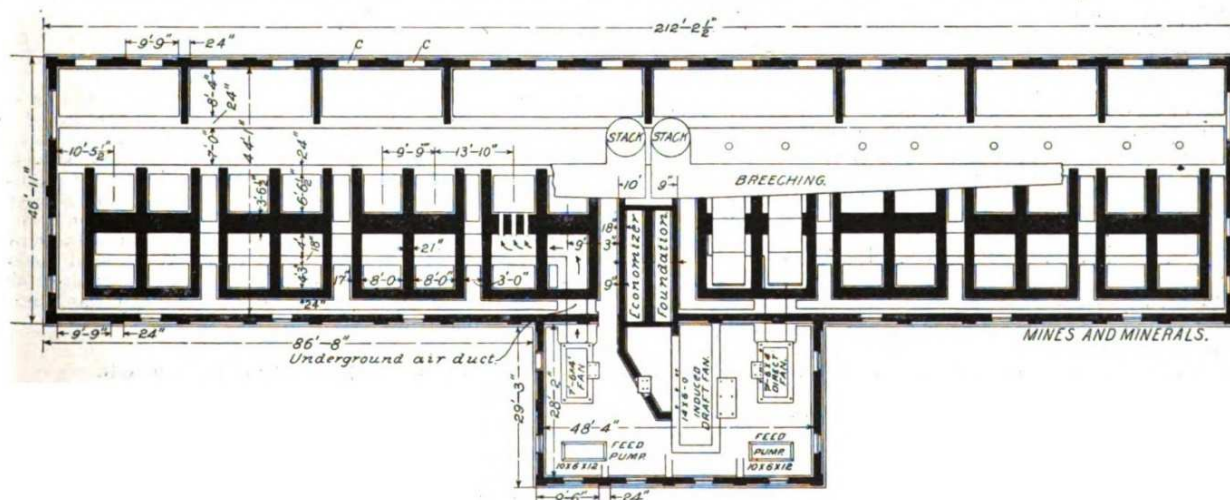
Plan of the new Boiler Plant for Hazleton Shaft
